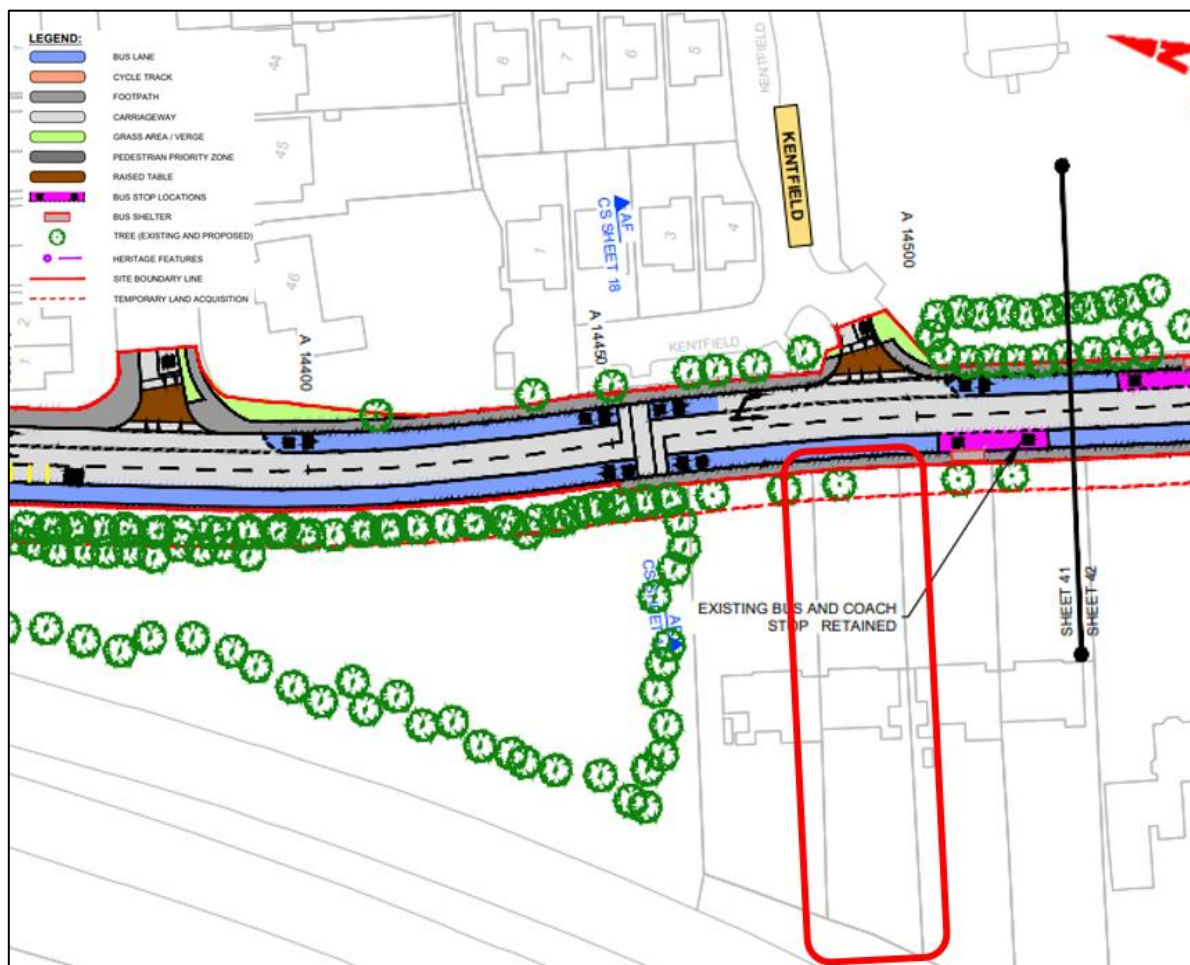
Extract from General Arrangement Drawing at Dublin Road (Sheet 41)
